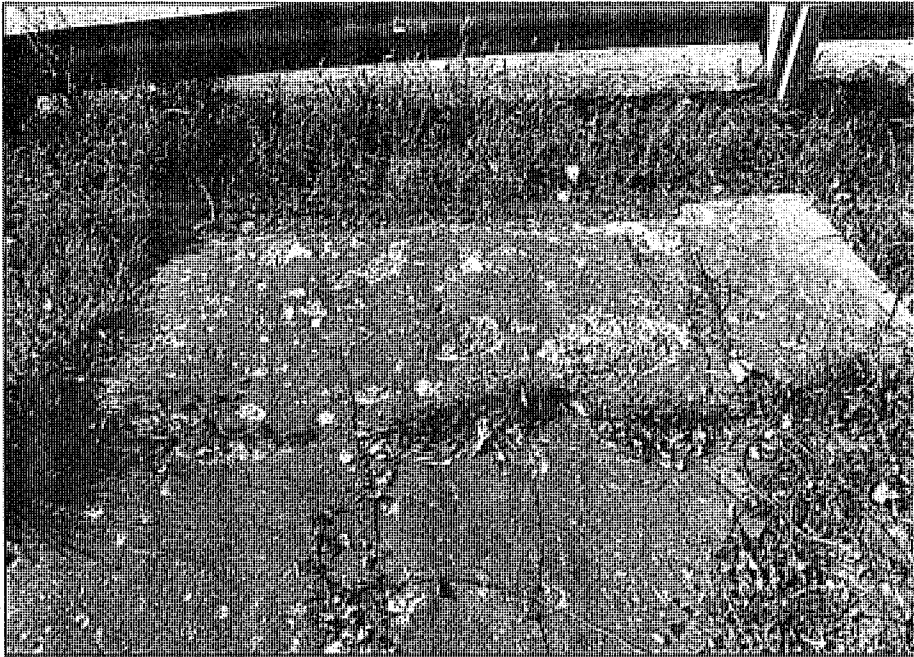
Concrete spalls on exposed tunnel roof slab adjacent to northbound highway lanes (above roof slab area shown in Photo No. 9).
